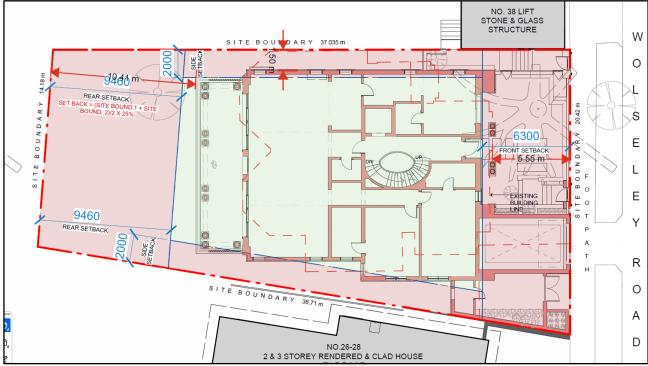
Proposed building setback diagram. Source: Submitted Architectural Plans
